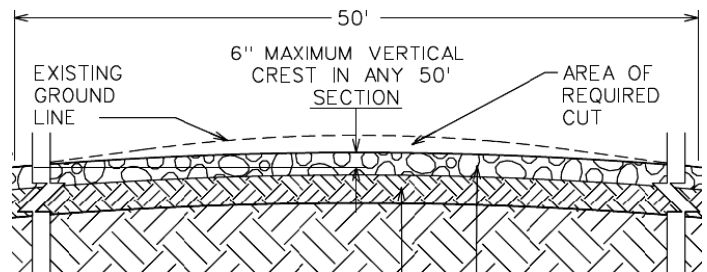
Typical Road Profile Crossing Existing Crest Area
